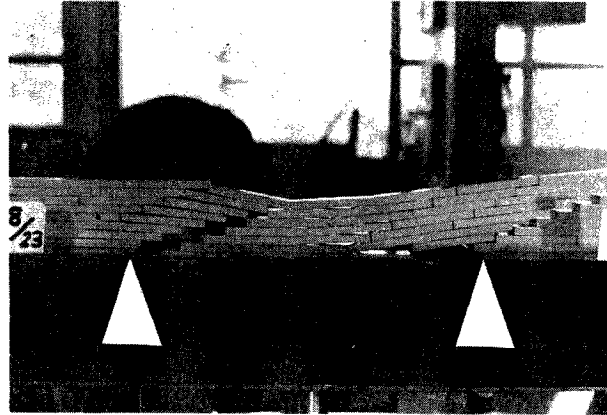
Failure pattern of blocks piled in horizontal strata with unsymmetrically staggered joint.
